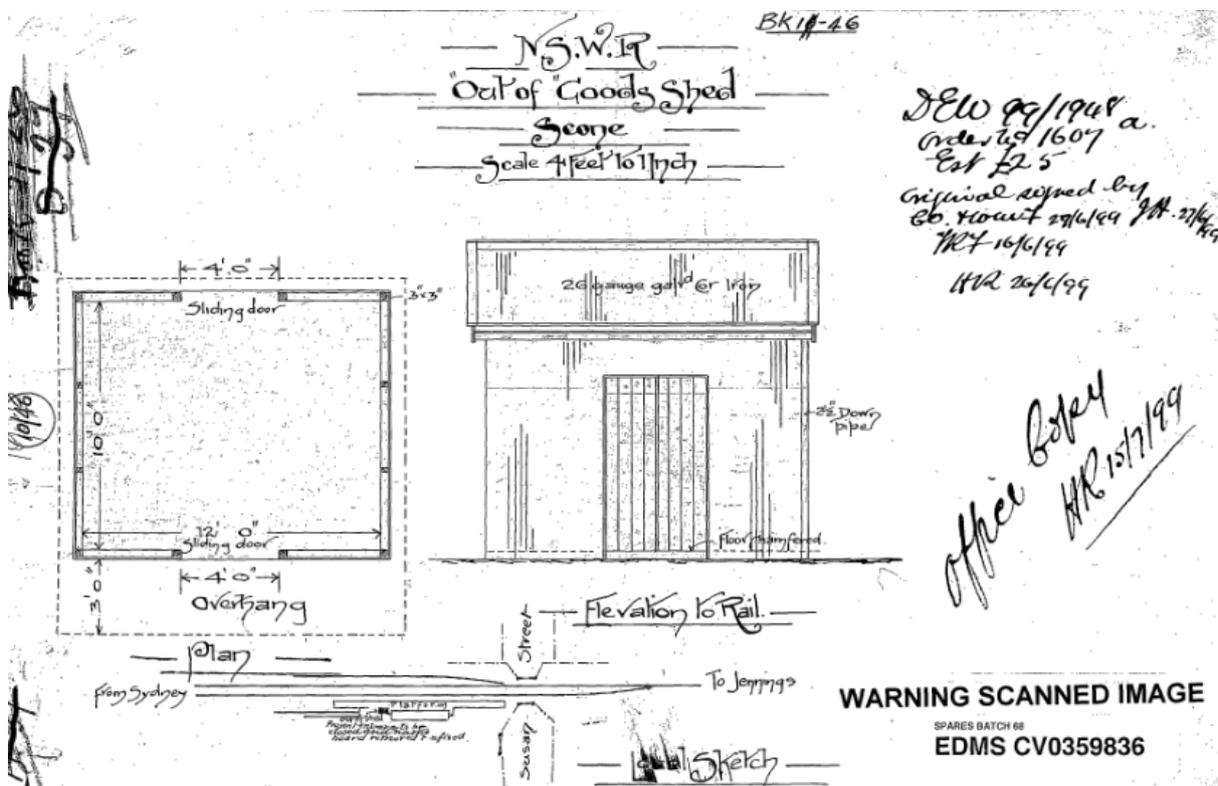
Example of dimensions of “Out-of” sheds, this example from Scone (Sydney Trains Virtual Plan Room)
